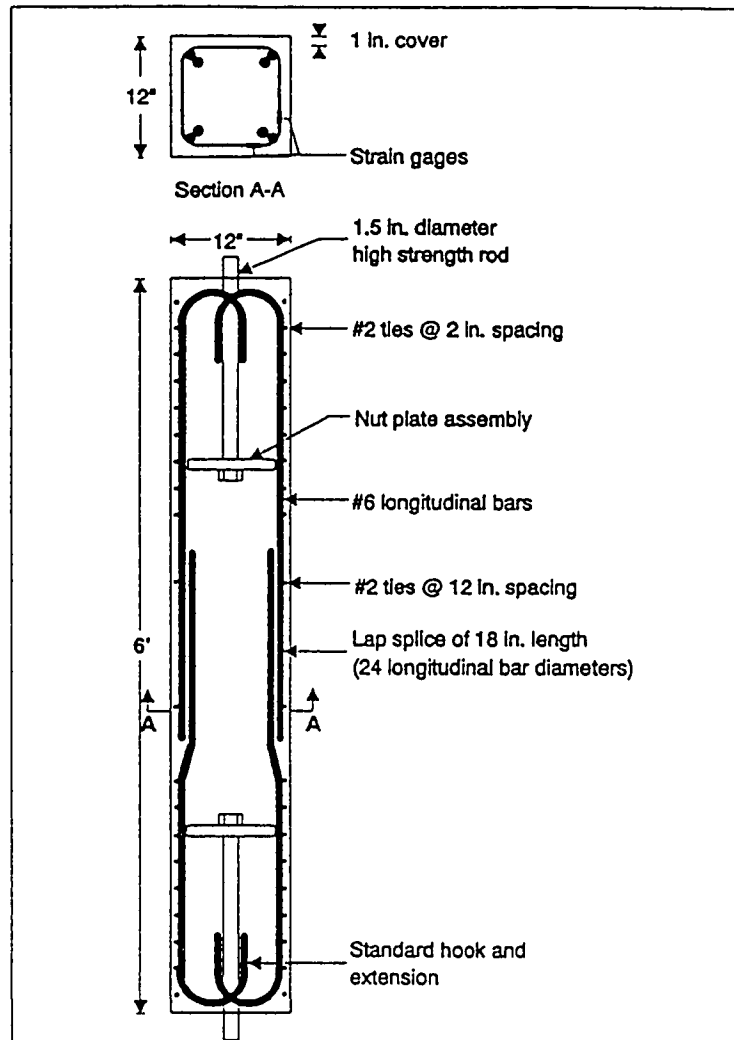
Strengthening of Columns With Inadequate Lap Splices, Reinforcement Details of the basic Column, Ref.[23].
